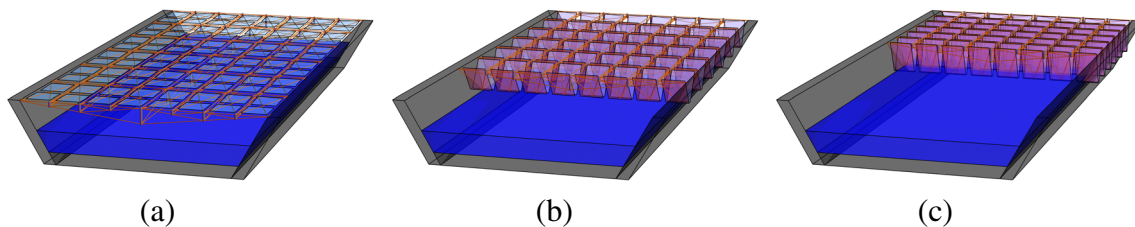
Different configurations of a deployable solar roof for water canals: a open onfiguration, b transition between open/closed configurations, c closed configuration
